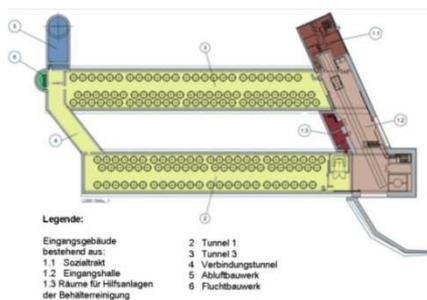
Layout of the tunnel storage facility at Neckarwestheim (Germany)
